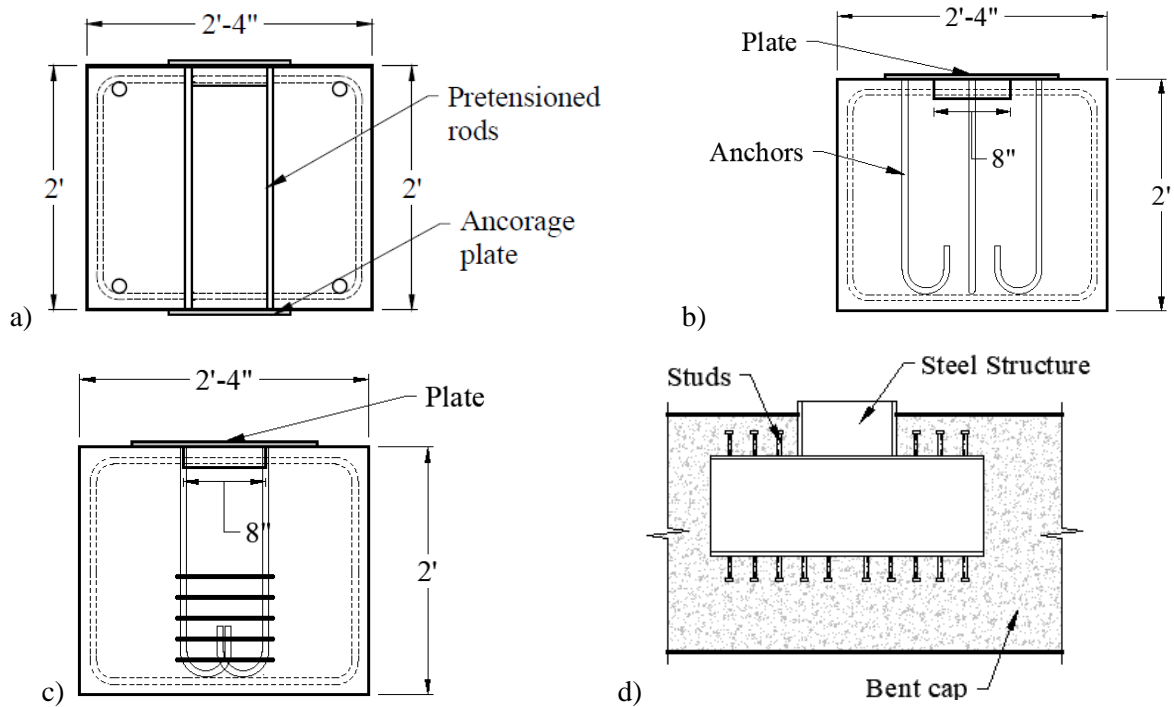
Connection to concrete with a) pretensioned rods, b) J-hooked anchors, c) J-hooked anchors with stirrups, and d) embedded steel shape
